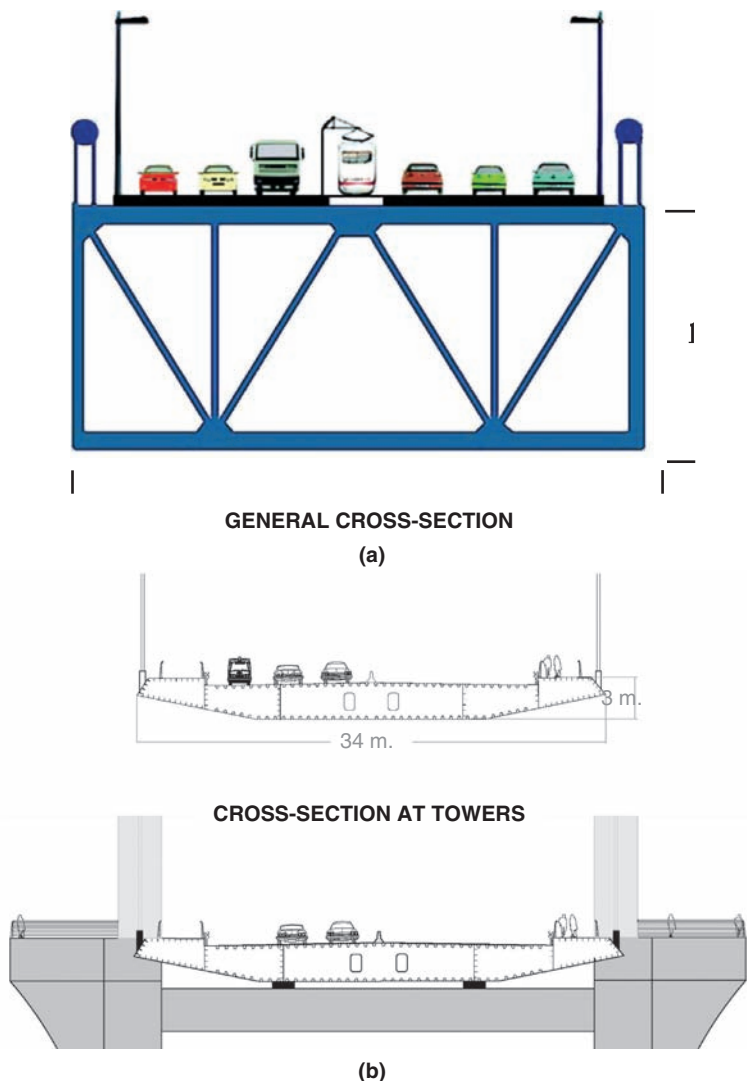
Types of bridge deck. (a) Truss bridge deck. (b) Box bridge deck.
